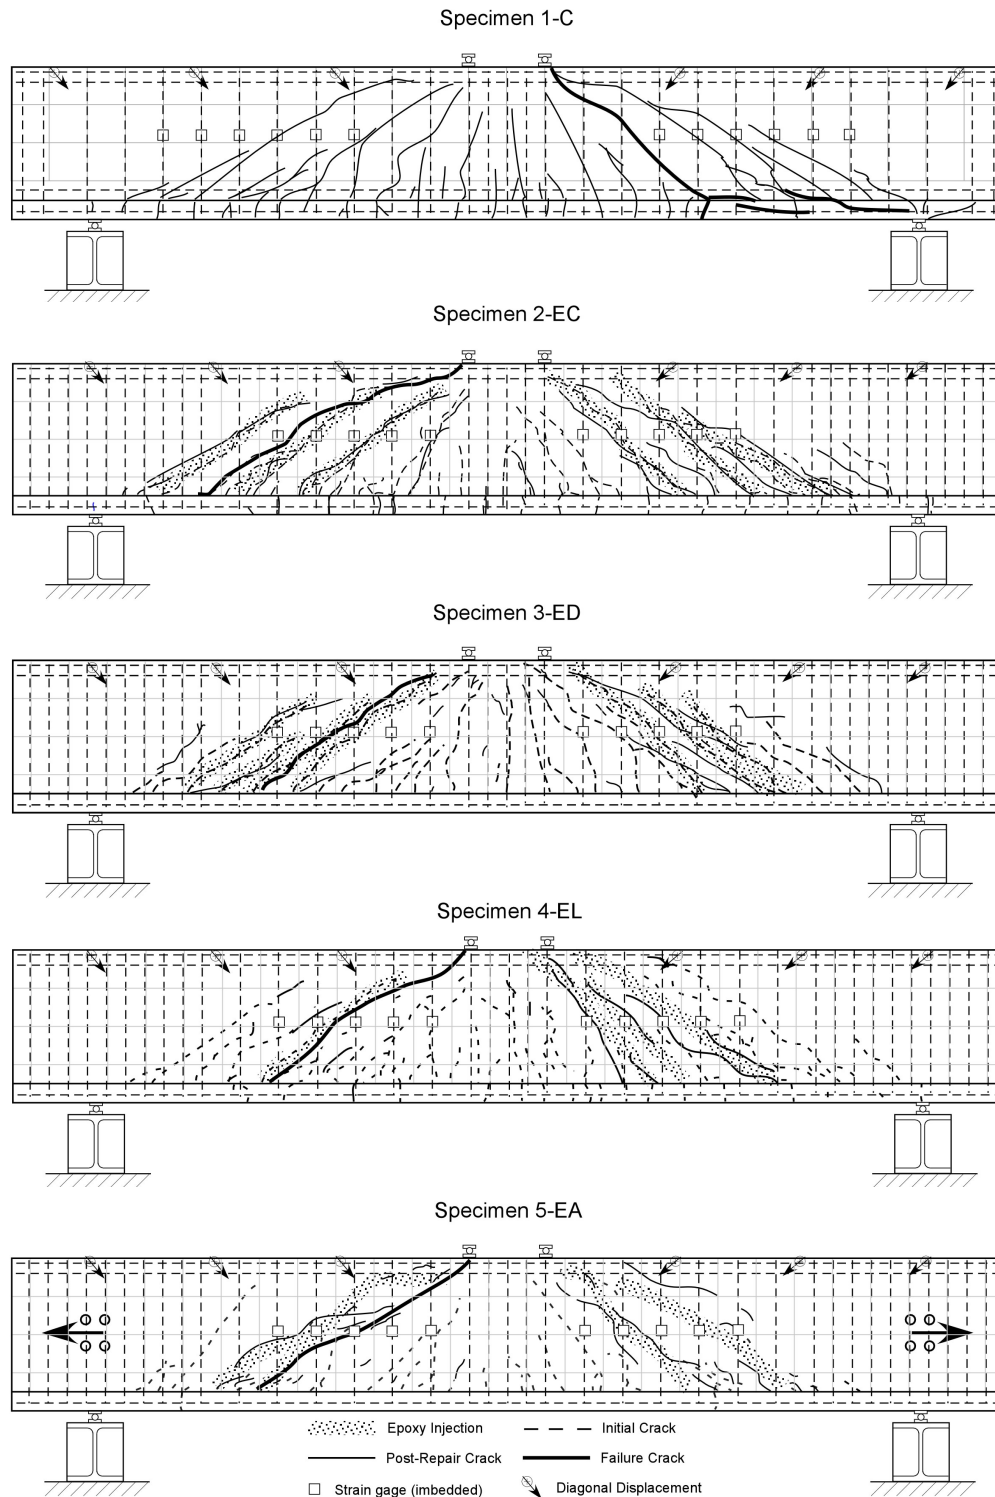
Crack pattern locations on east face of specimens. Figure includes precracking, epoxy injected cracks, post-injection cracks, and final failure crack.
